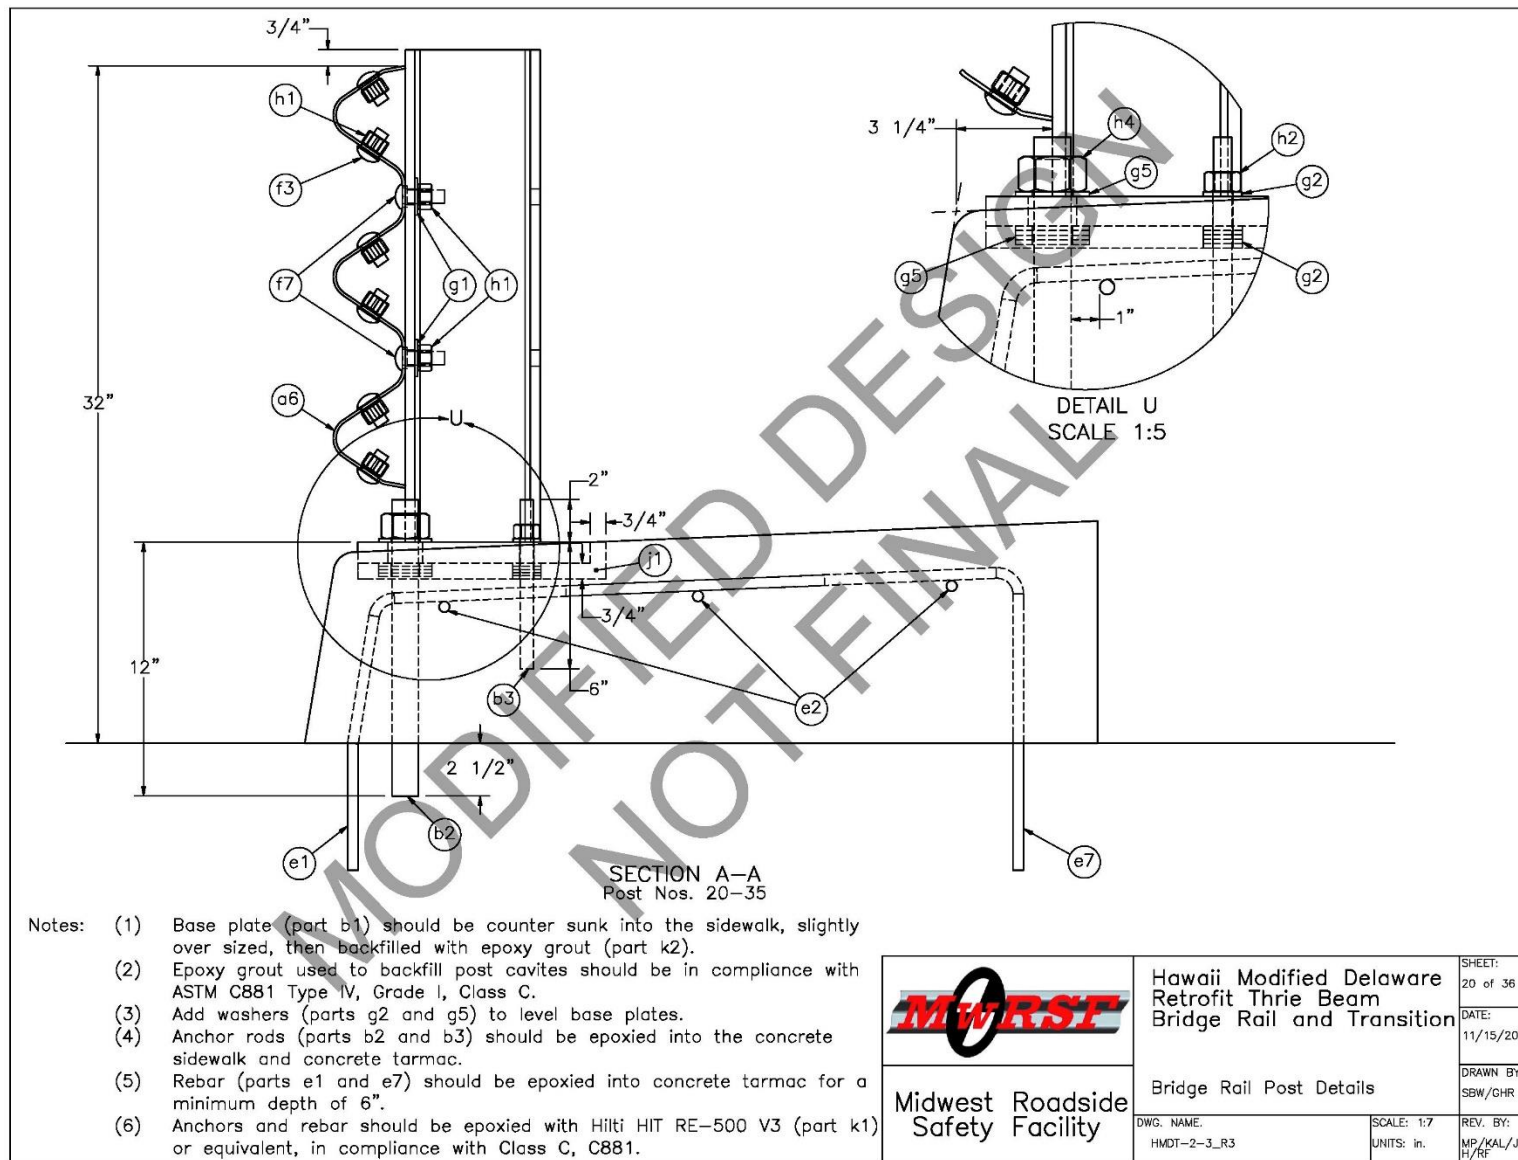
Bridge Rail Post Details, Test Nos. HMDT-2 and HMDT-3
